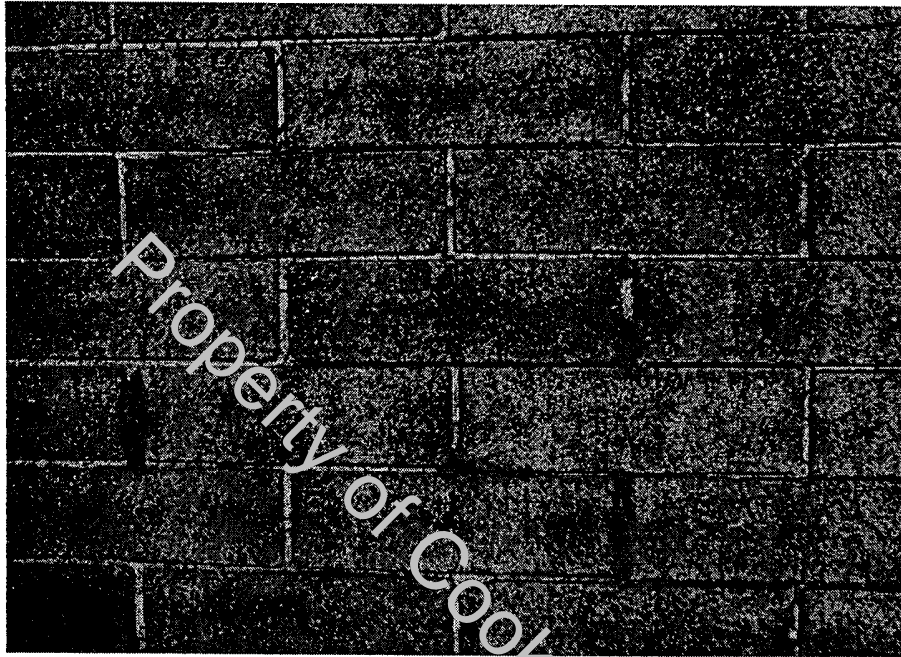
Representative example of brickwork with previously cleaned brick, deteriorated mortar joints and some minor cracking.
